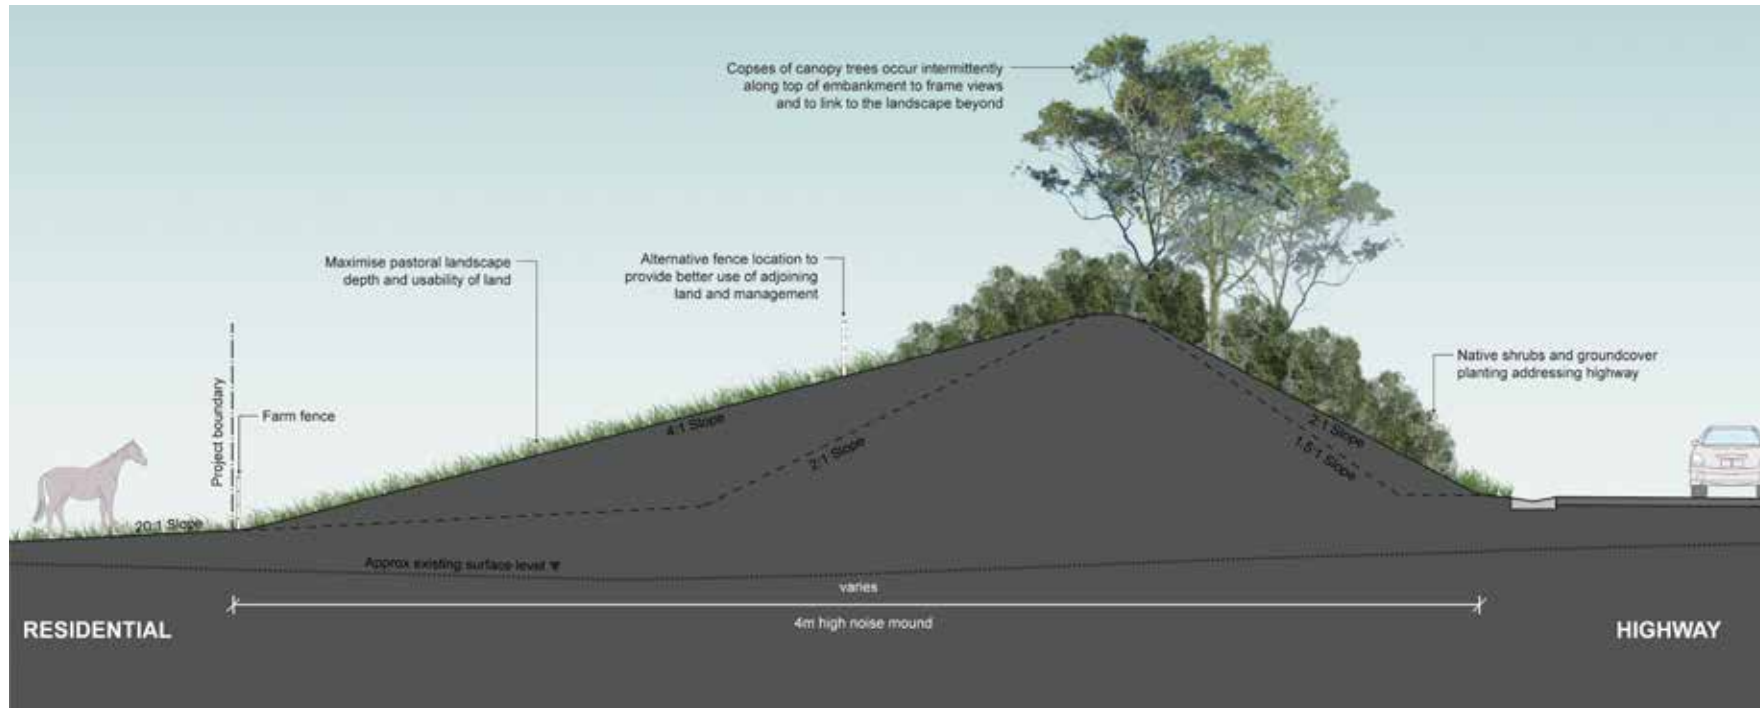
North Street noise barrier NB01 - Design: proposed typical cross section
